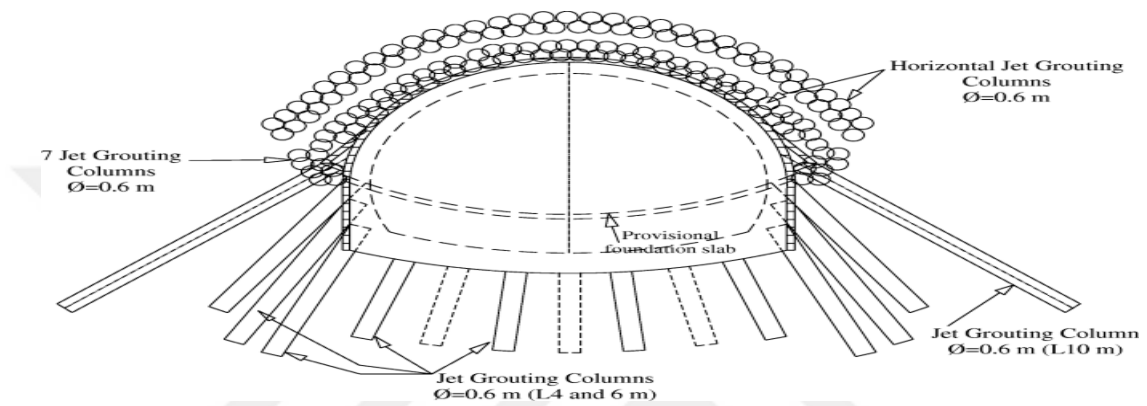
Application areas of the figure Jet grout column (Soletanche Bachy)
